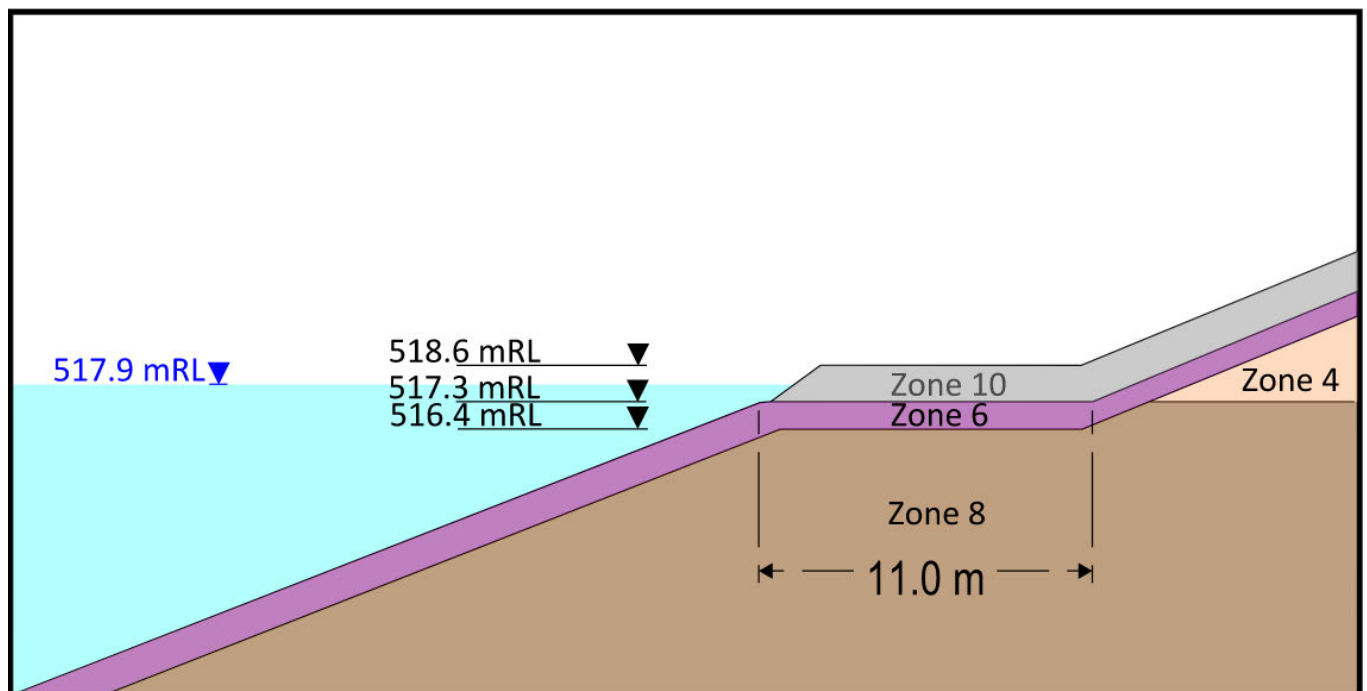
Schematic sketch - cross section at Main Dam upstream showing the existing construction bench (517.3 m RL)
